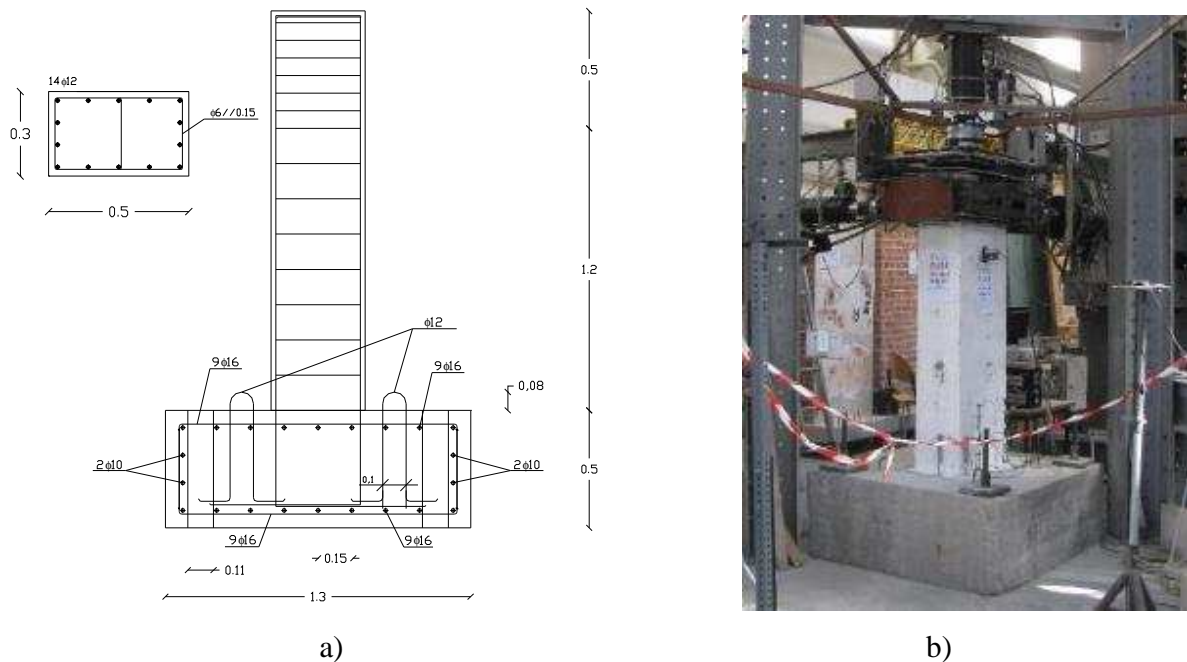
Experimental campaign: a) RC column specimen dimensions and reinforcement detailing; and b) General overview of the test setup.
